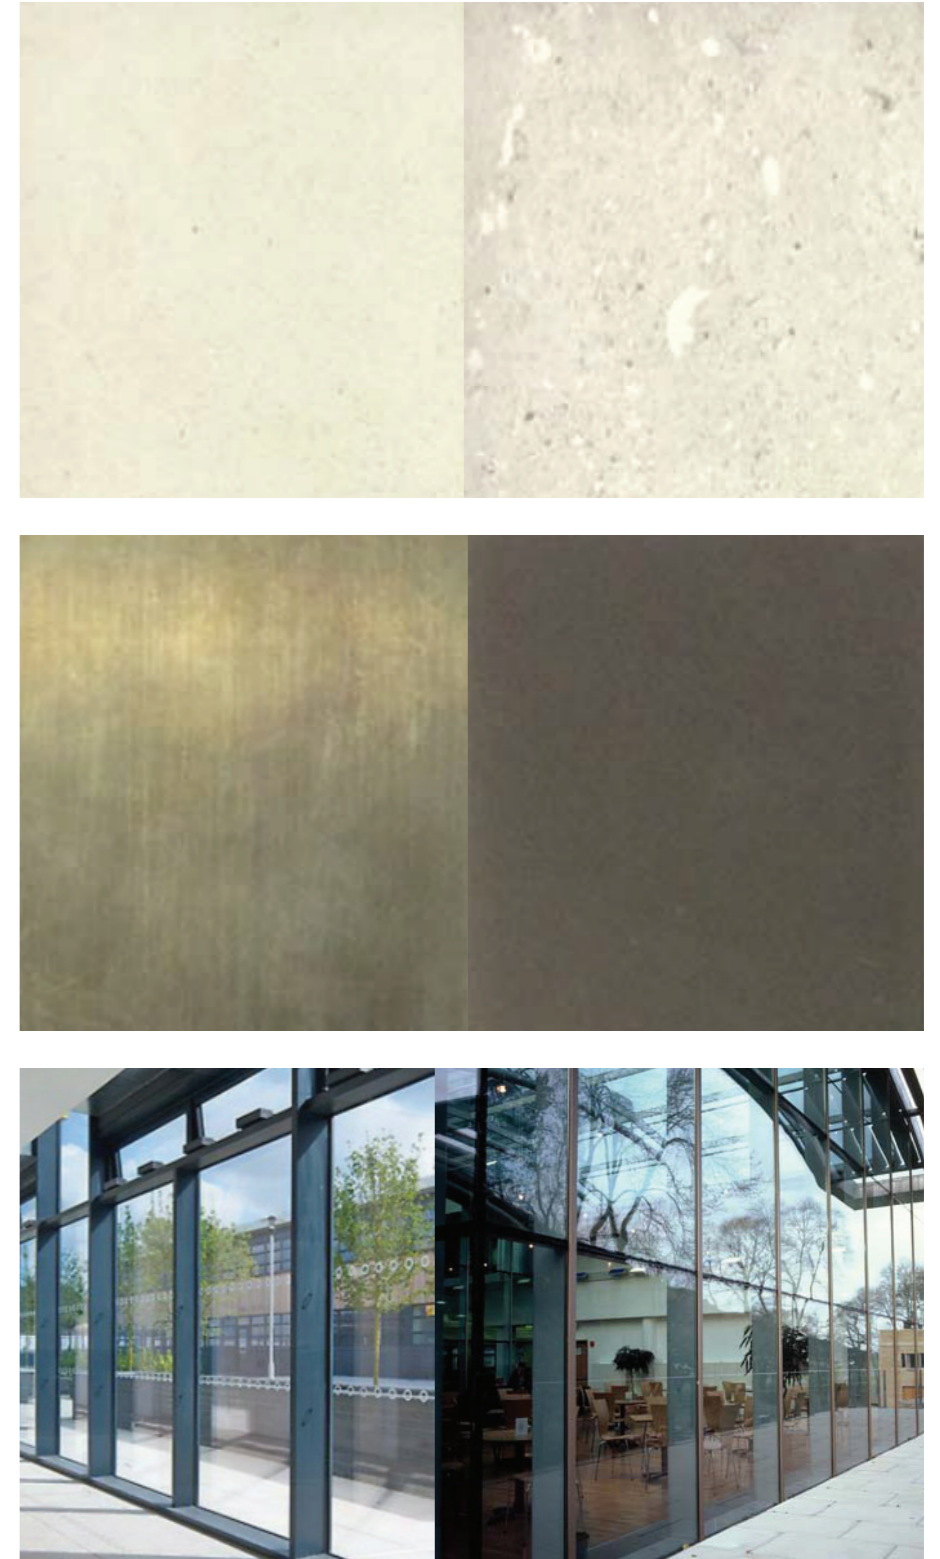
Indicative materials to be used - Portland stone, bronze and curtain wall glazing
